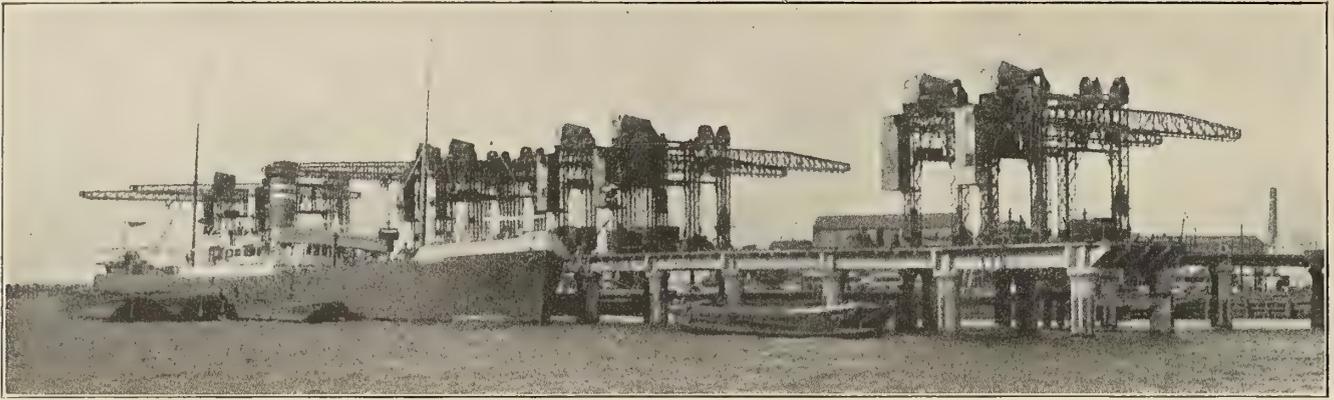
INSTALLATION OF EIGHT CRANES AT DAGENHAM DOCKS
